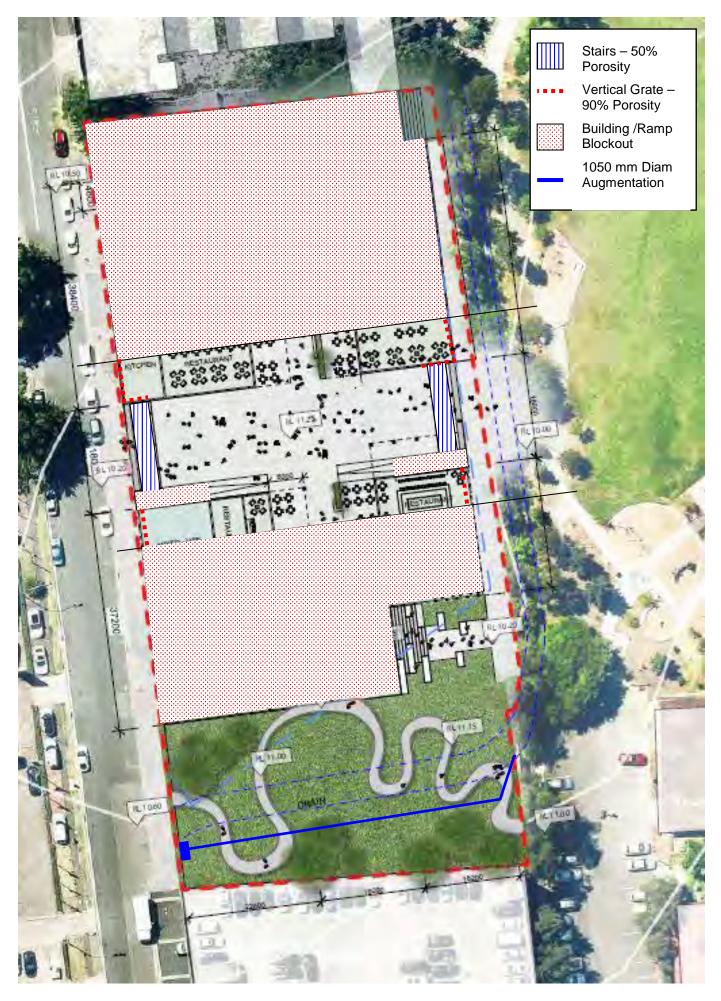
Primary Features of Model Layout under the Amended Planning Proposal
